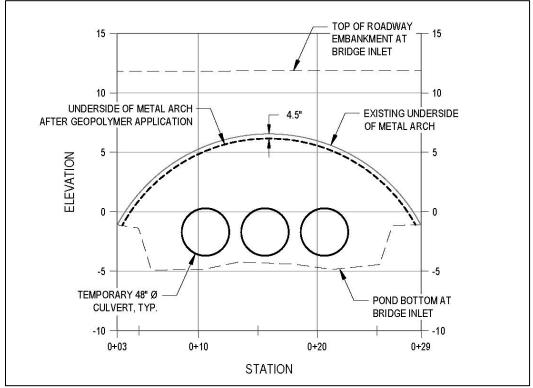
Water Diversion Alternative 2.1 Bridge Inlet Cross-Section
